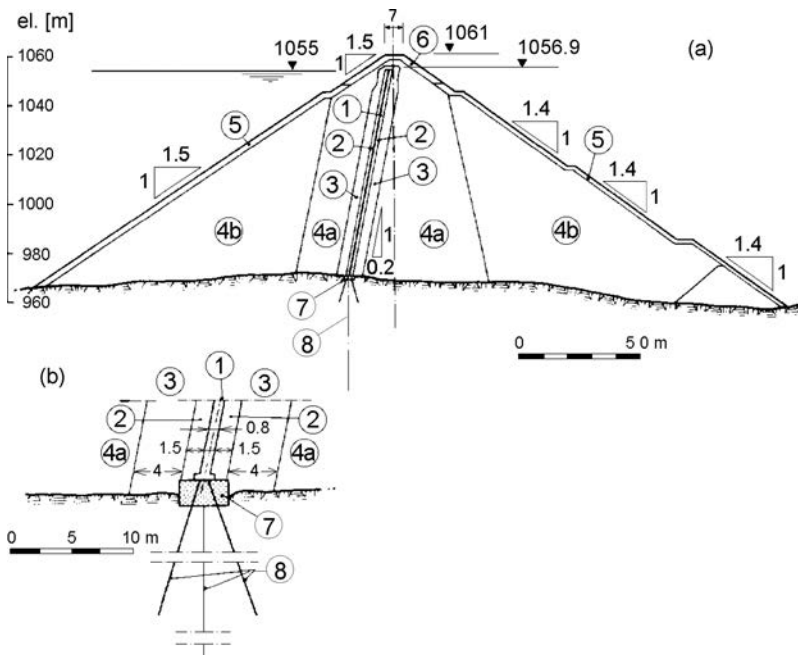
Cross-section of Storvatn dam (a) and detail of foundation of asphaltic concrete core (b) (after Arnevik et al., 1988). (1) Asphaltic concrete diaphragm; (2) transition zone (crushed rock 0–60 mm); (3) transition zone (crushed rock 0–200 mm); (4a) quarried rock 0–400 mm; (4b) quarried rock 0–800 mm; (5) slope protection (large blocks); (6) crown cap; (7) concrete sill; (8) grout curtain.
